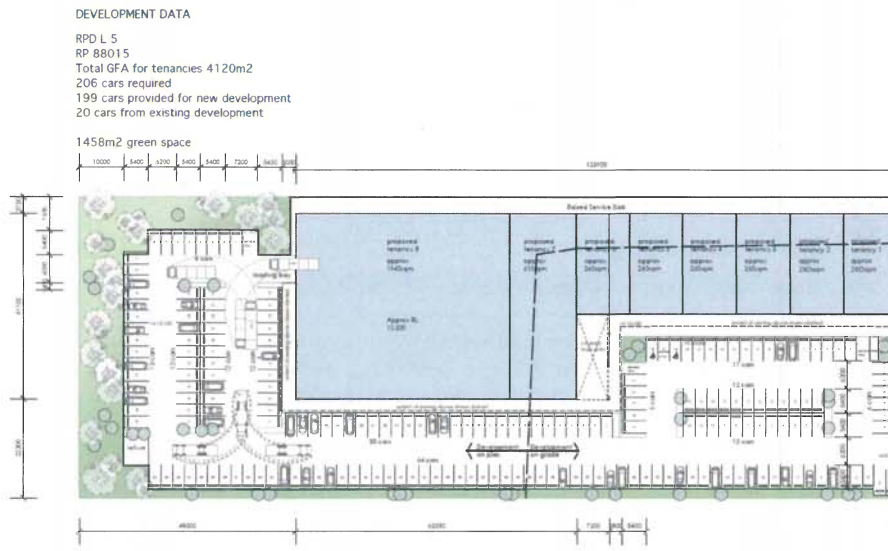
Submitted Development Plan 134 Morayfield Road Caboolture South
